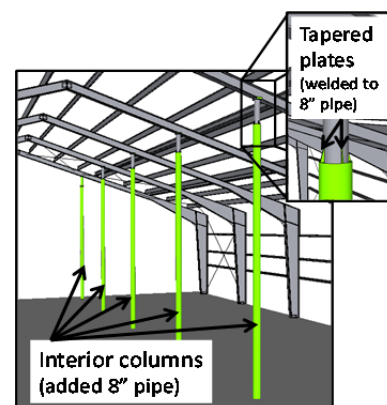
Column mitigation to improve stability and prevent frame shear failure with existing members (gray) and retrofit columns and plates (green)
